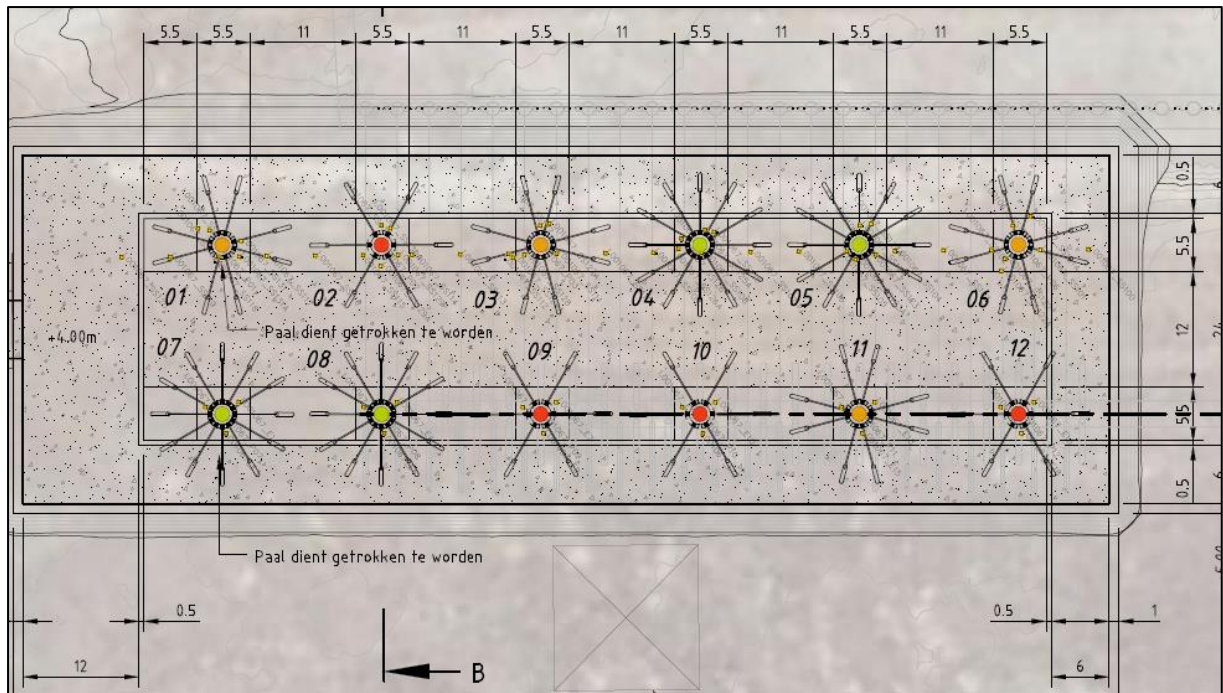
Site plan of the pile test site. In orange: vibro piles P01, P03, P06, P11; in green: screw injection piles P04, P05, P07, P08; in red: driven precast piles: P02, P09, P11, P12
